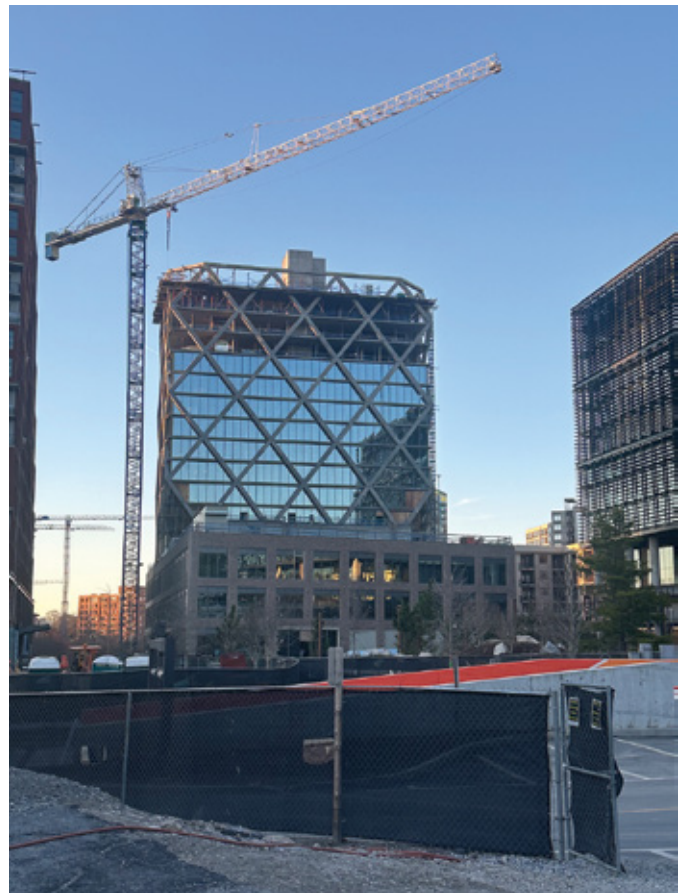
View of the project from the south showing a flying ring beam around the roof level
